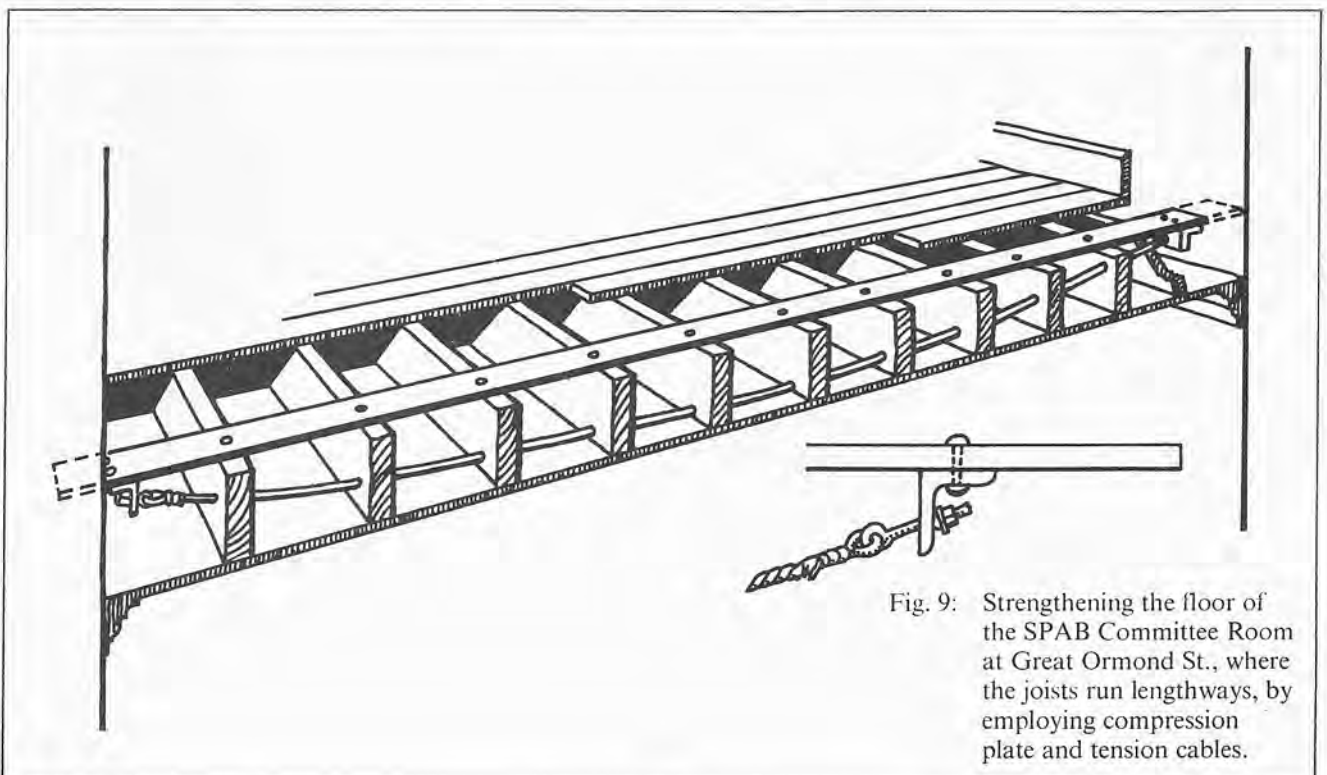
Strengthening the floor of the SPAB Committee Room at Great Ormond St., where the joists run lengthways, by employing compression plate and tension cables.
